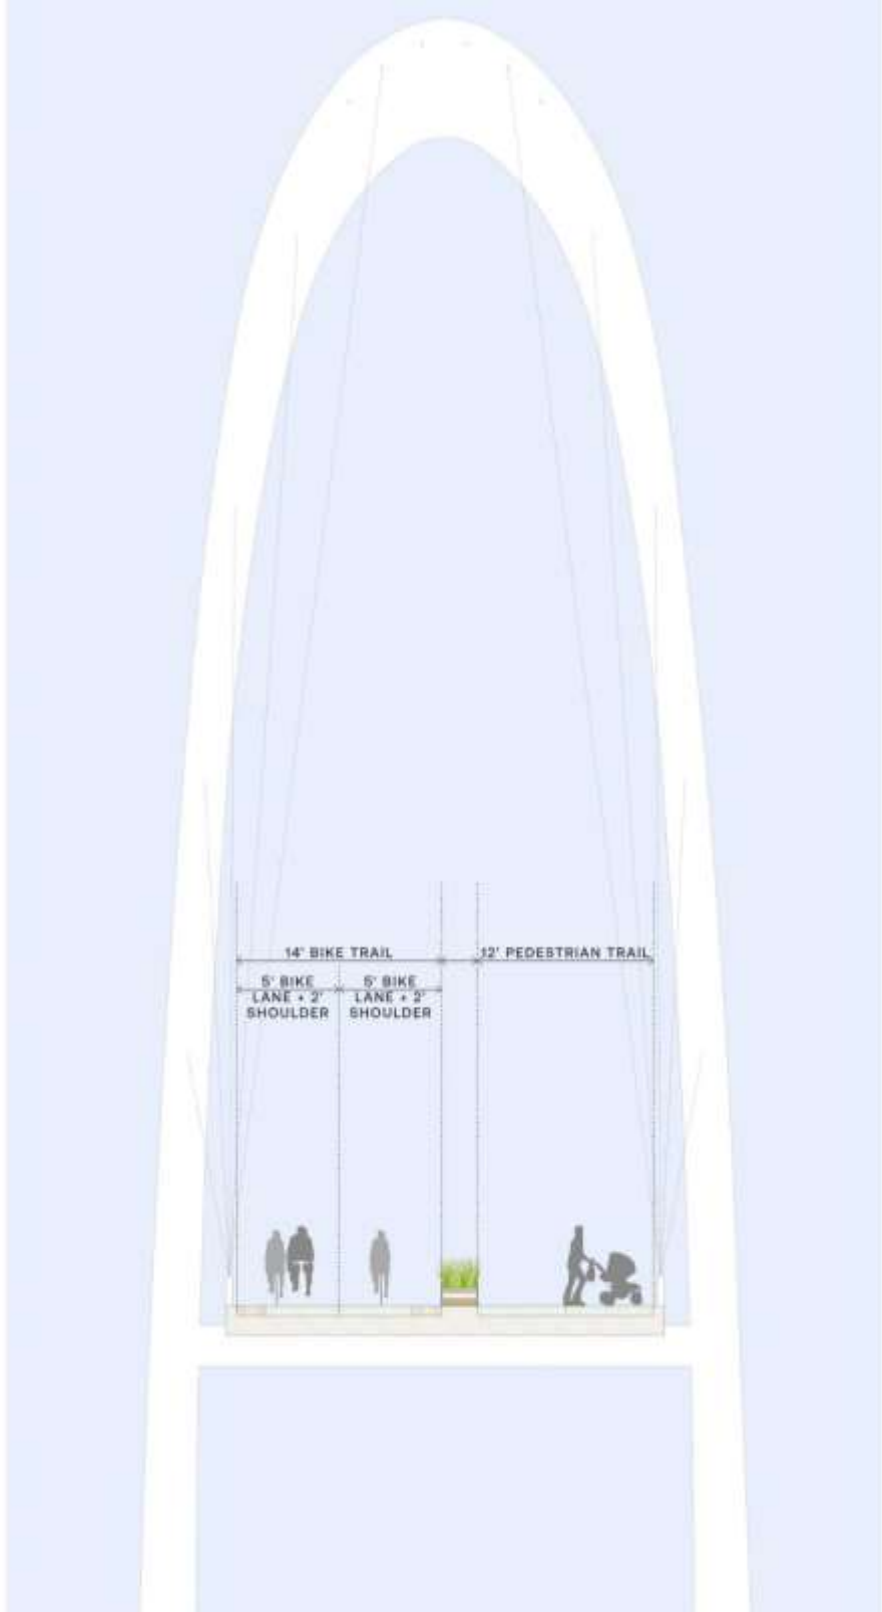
Section of the west tie-in structure, Cable-Stayed cantilever alternative.
